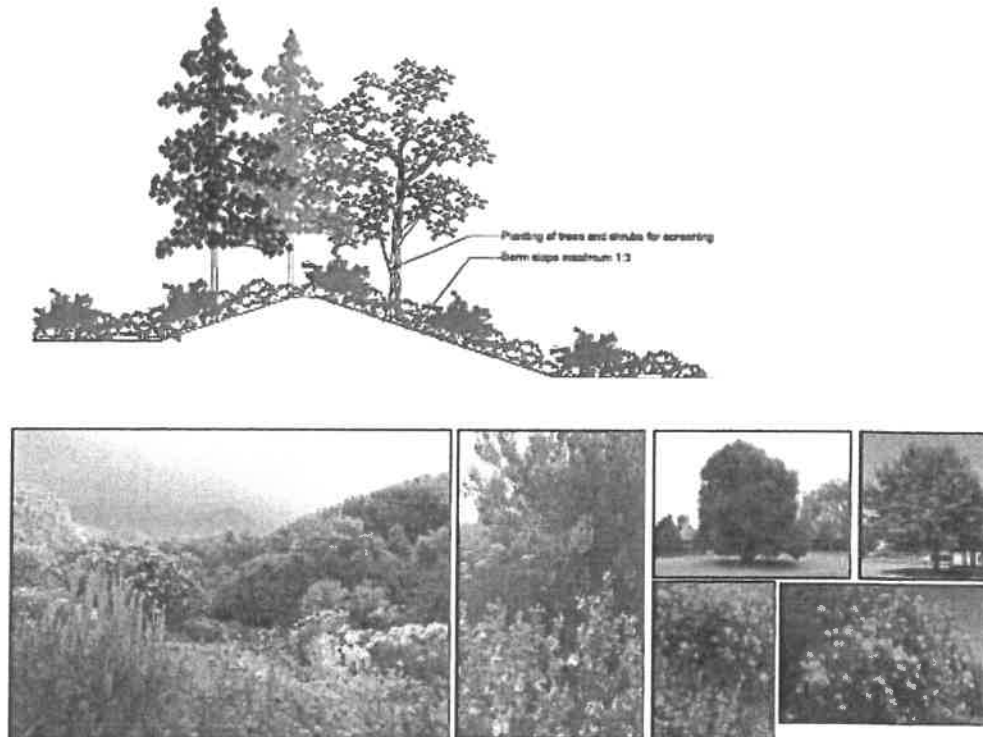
Planted berm concept (above) and Fynbos and Renosterveld planting species
